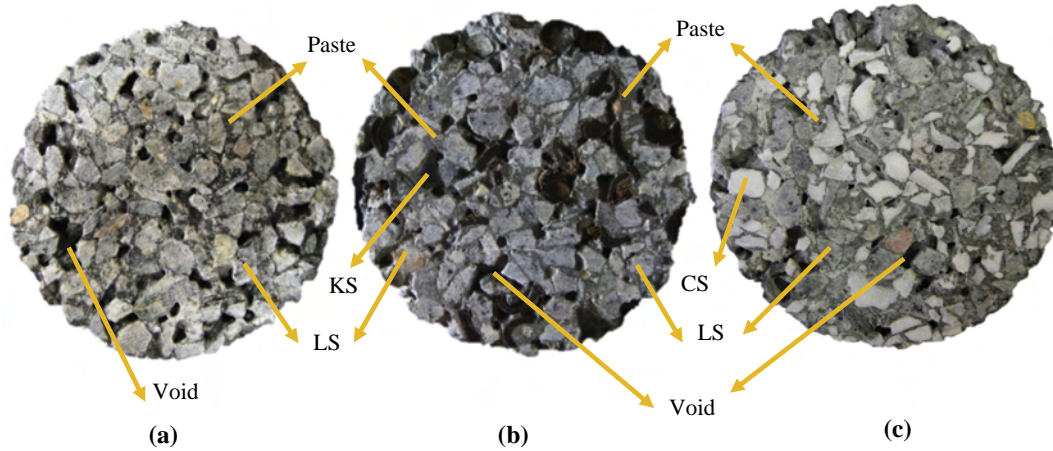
Structural arrangement of the pervious concrete matrix (a) with natural aggregate (LS); (b) with OPKS and (c) with CS.
